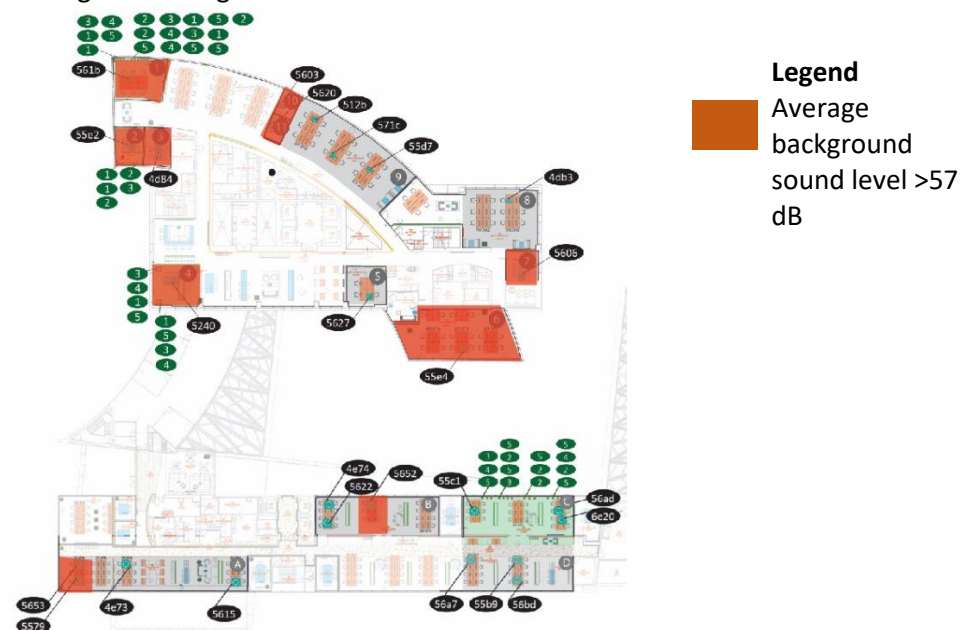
Average background sound level above 57 dB. Floorplan A11 above and floorplan E03 below.
